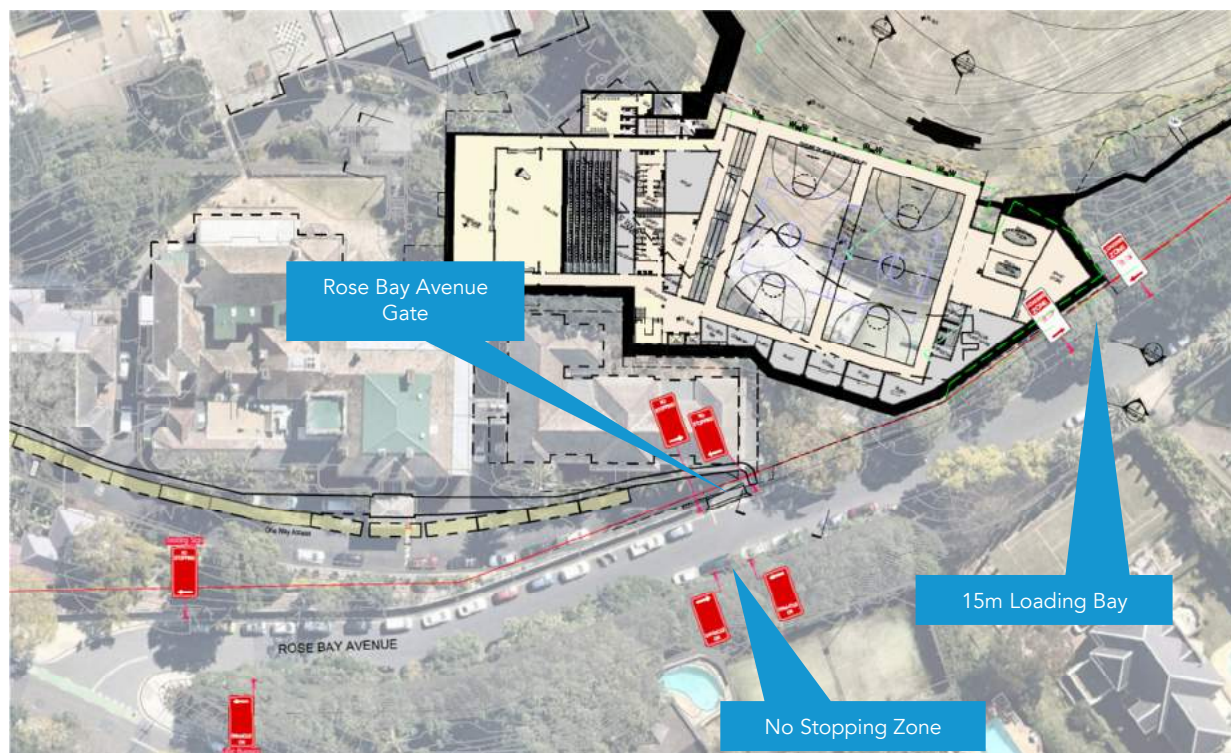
Proposed On-Street Parking Provisions (Rose Bay Avenue west)
